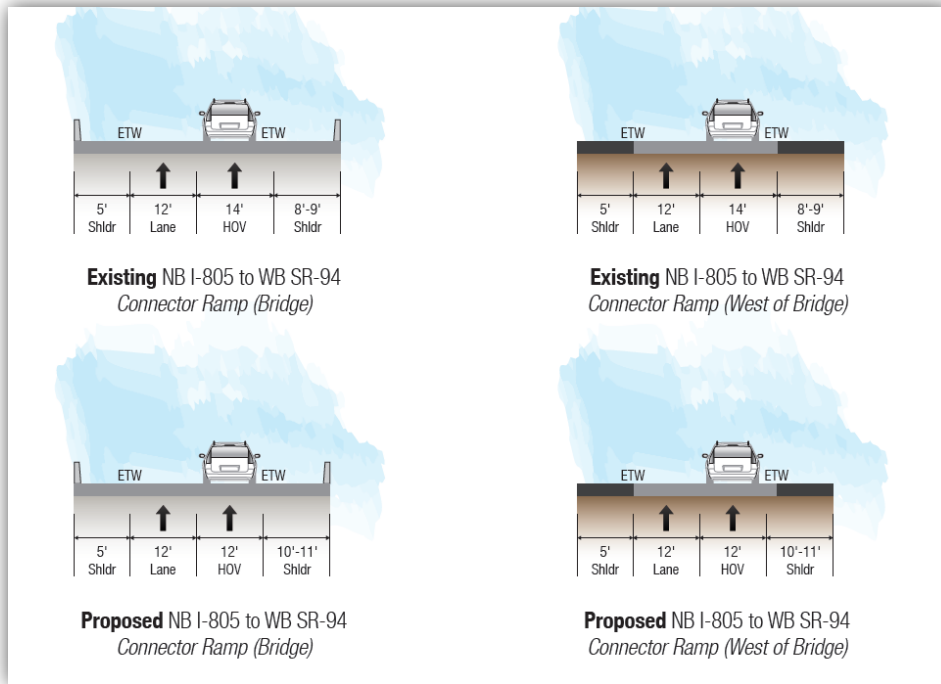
I-805 and SR-94 Connector Ramp Cross Sections
